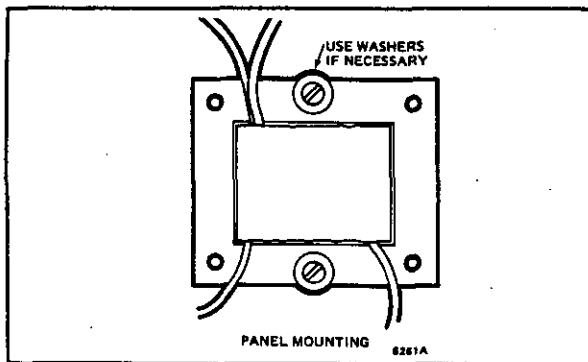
USE BOLTS IN SLOTS FOR PANEL MOUNTING.
